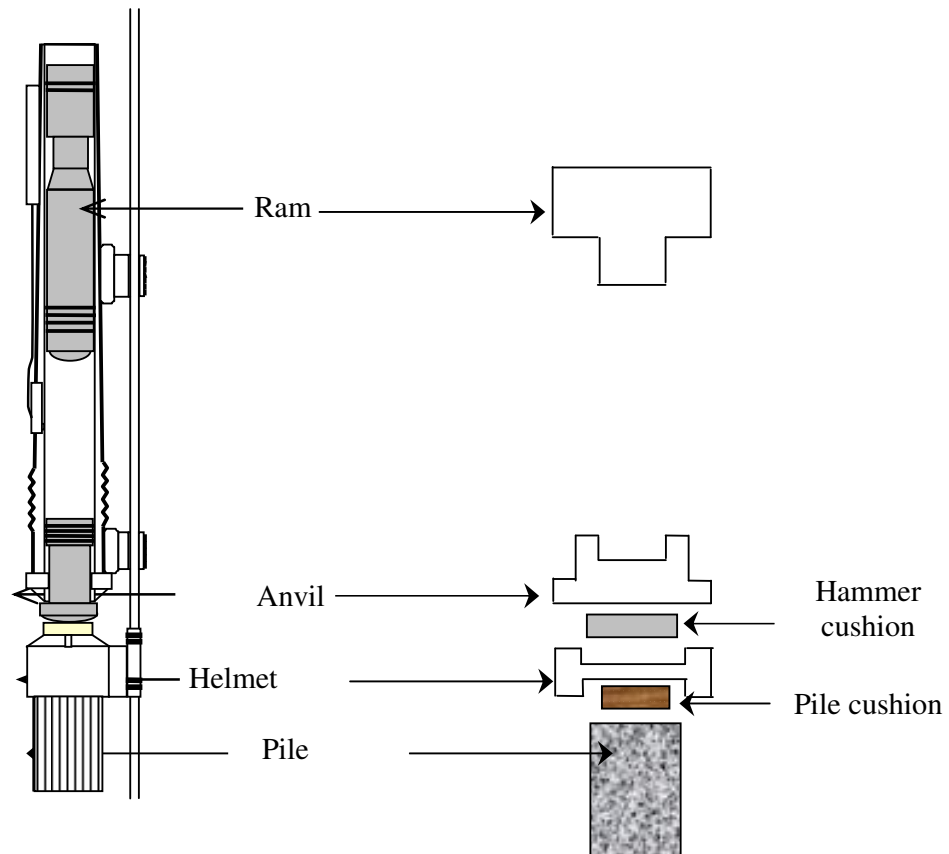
Schematic cross-sectional view of hammer and driving accessories
